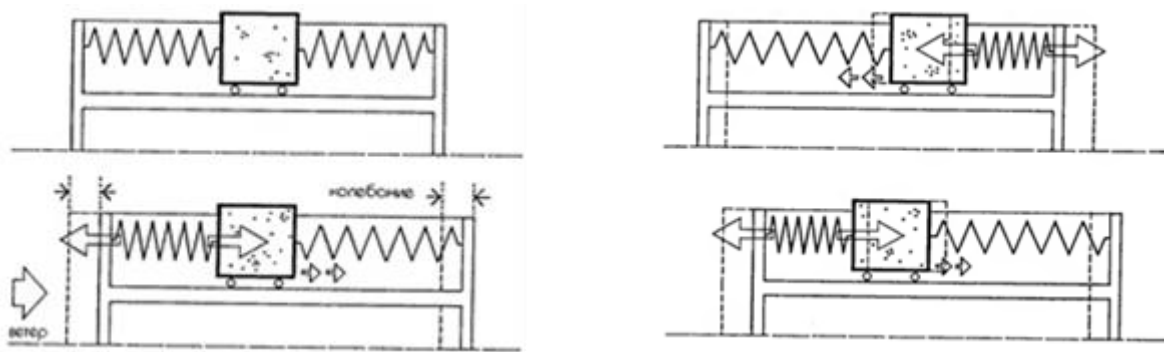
Horizontal vibration damping system, which is advisable to be located in grid floors
